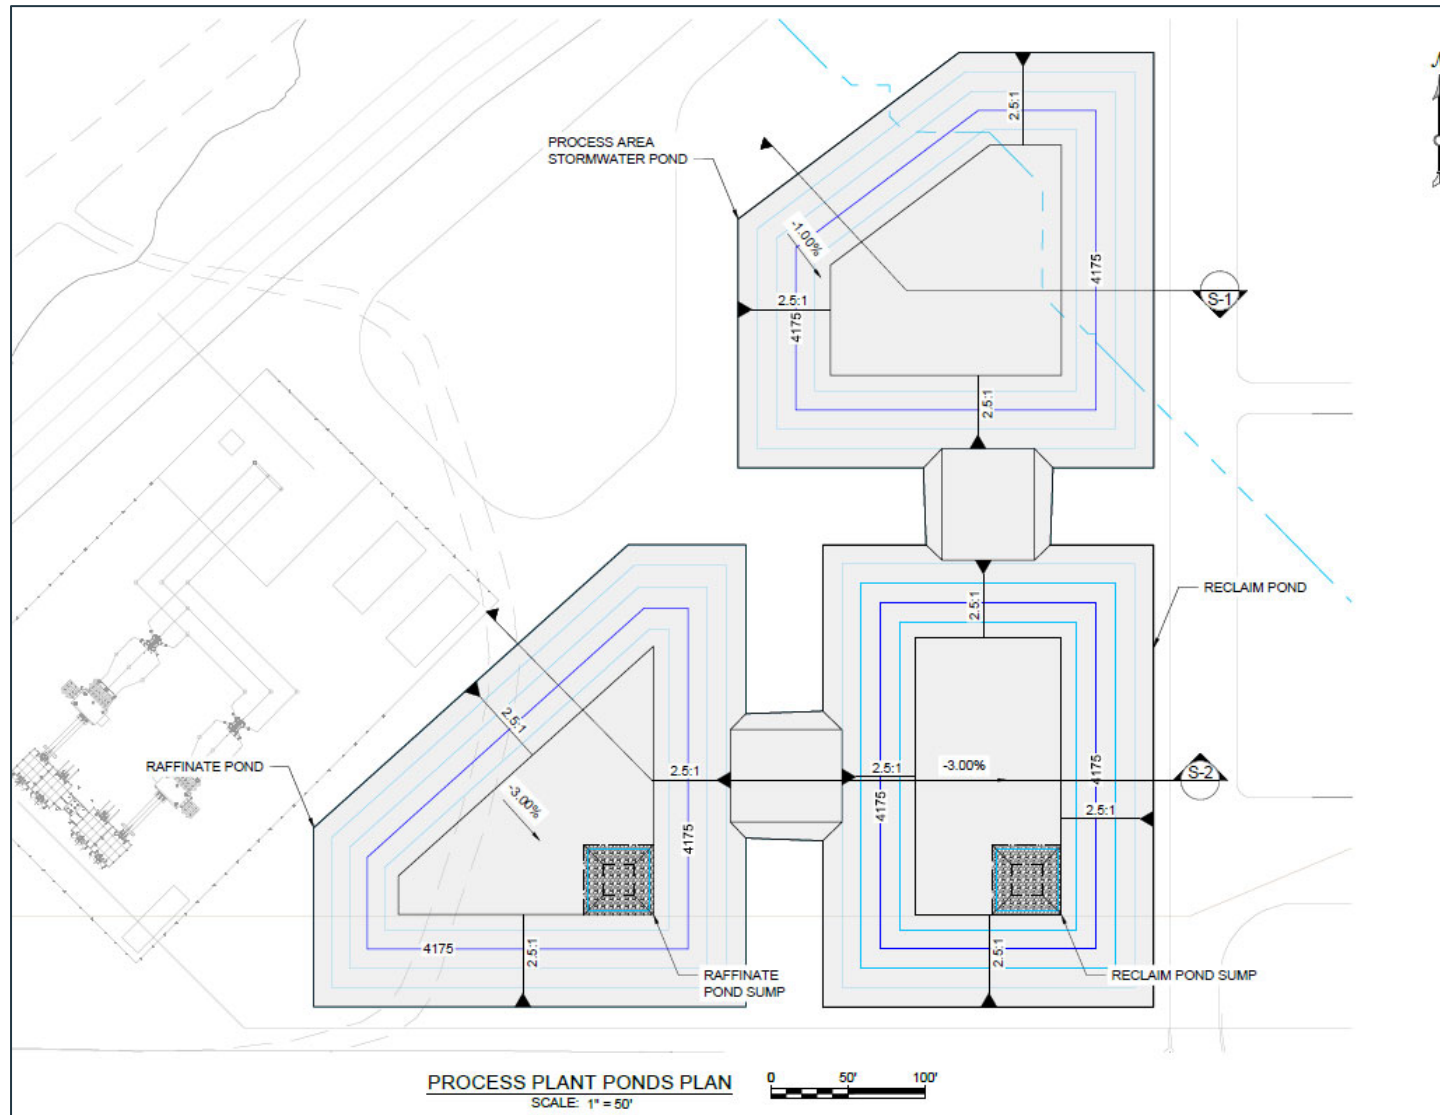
Location of cross sections S1 and S2 within Process Area Stormwater Pond, Reclaim Pond, and Raffinate Pond
